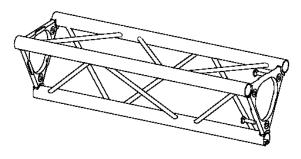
Cross section of tri-lock beam used to create the new tunnel
